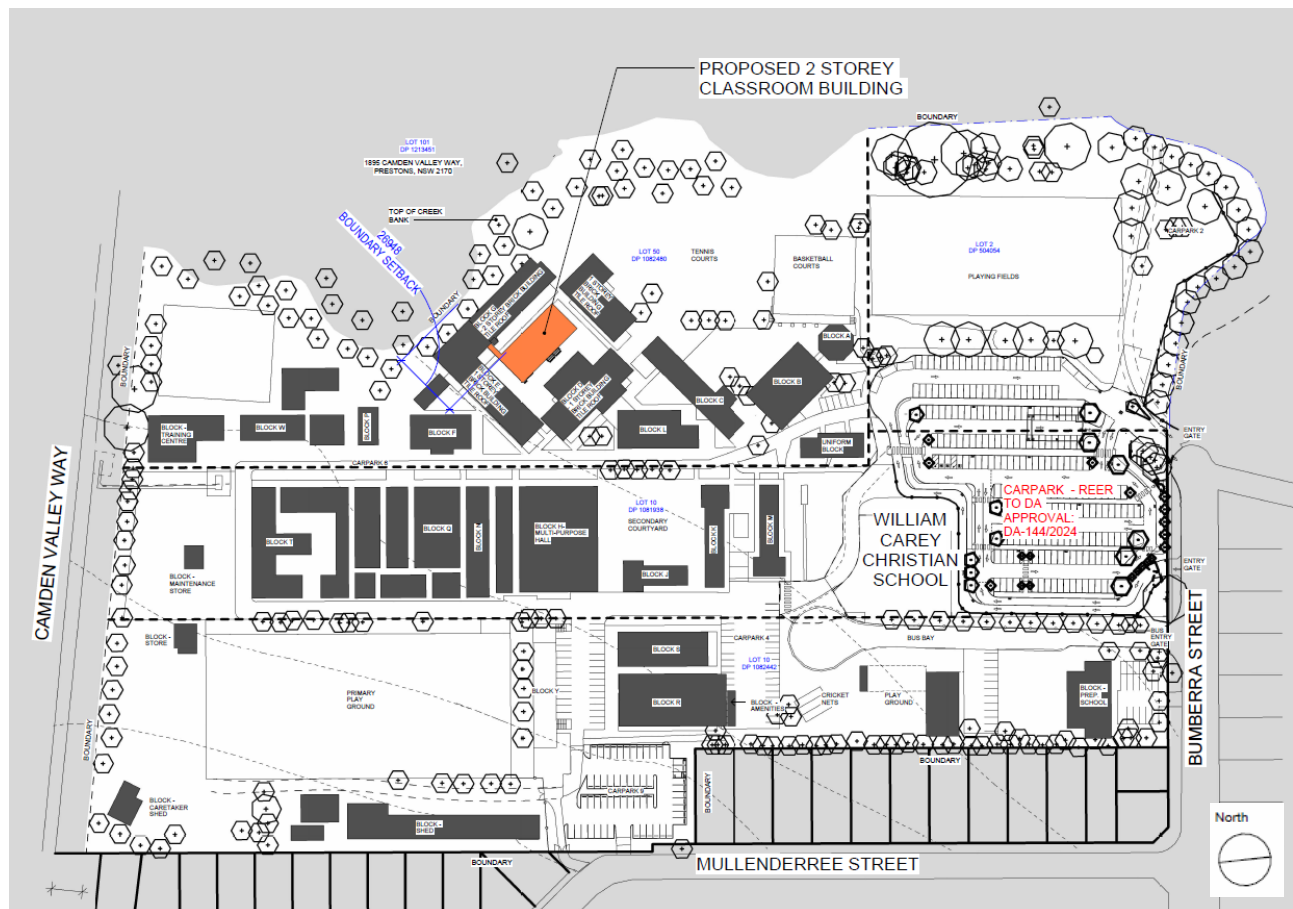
Proposed site plan with new two (2) modular building identified in orange (Source: Marathon Modular)
